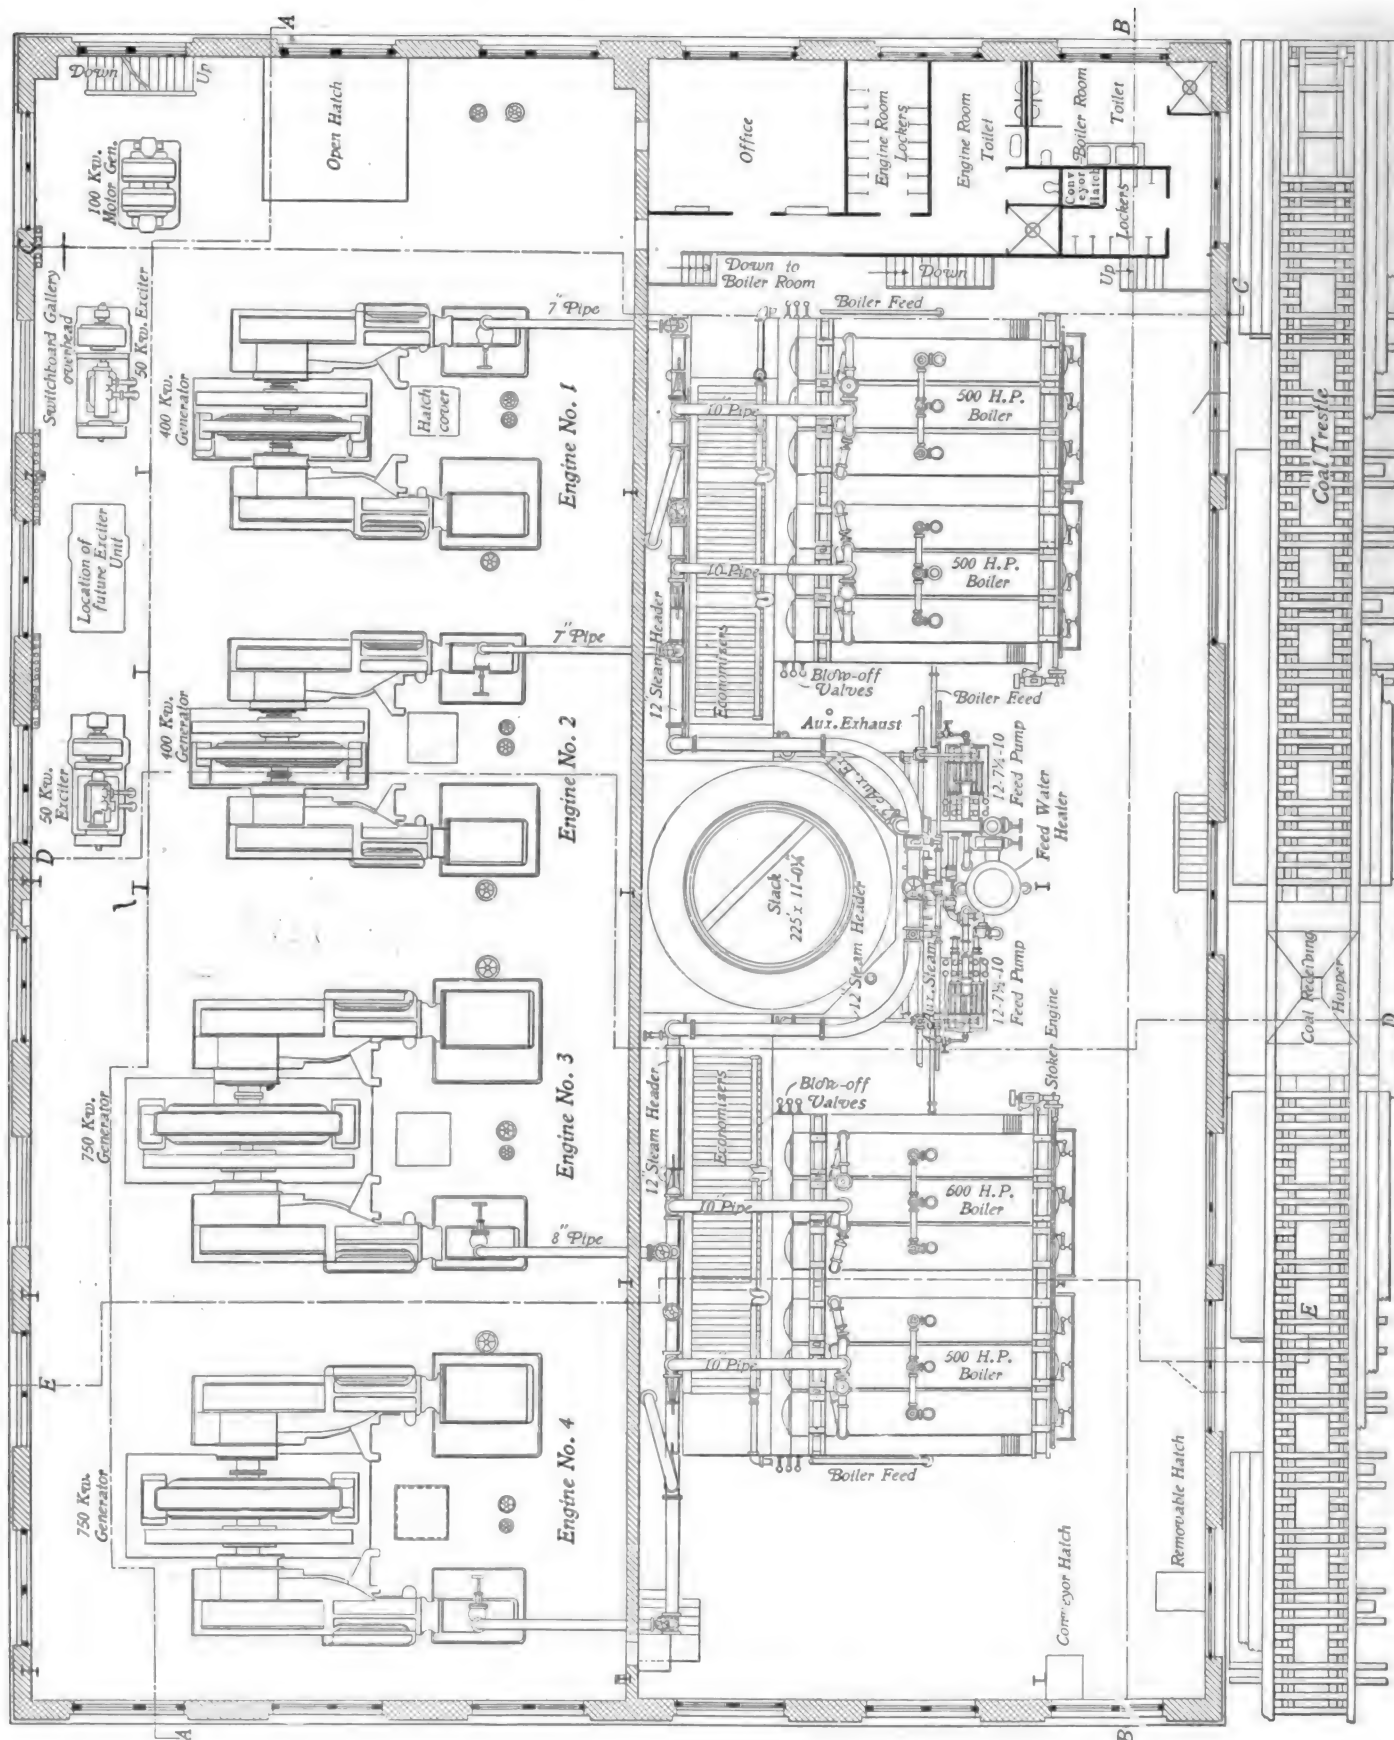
PLAN VIEW OF THE ENGINE AND BOILER ROOMS OF THE NEW YORK CENTRAL TERMINAL POWER PLANT AT WEEHAWKEN, N. J.
